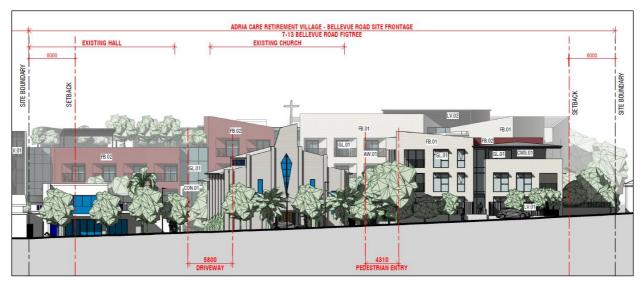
Proposed Buildings to Bellevue Road, Plan, AMC Architecture
